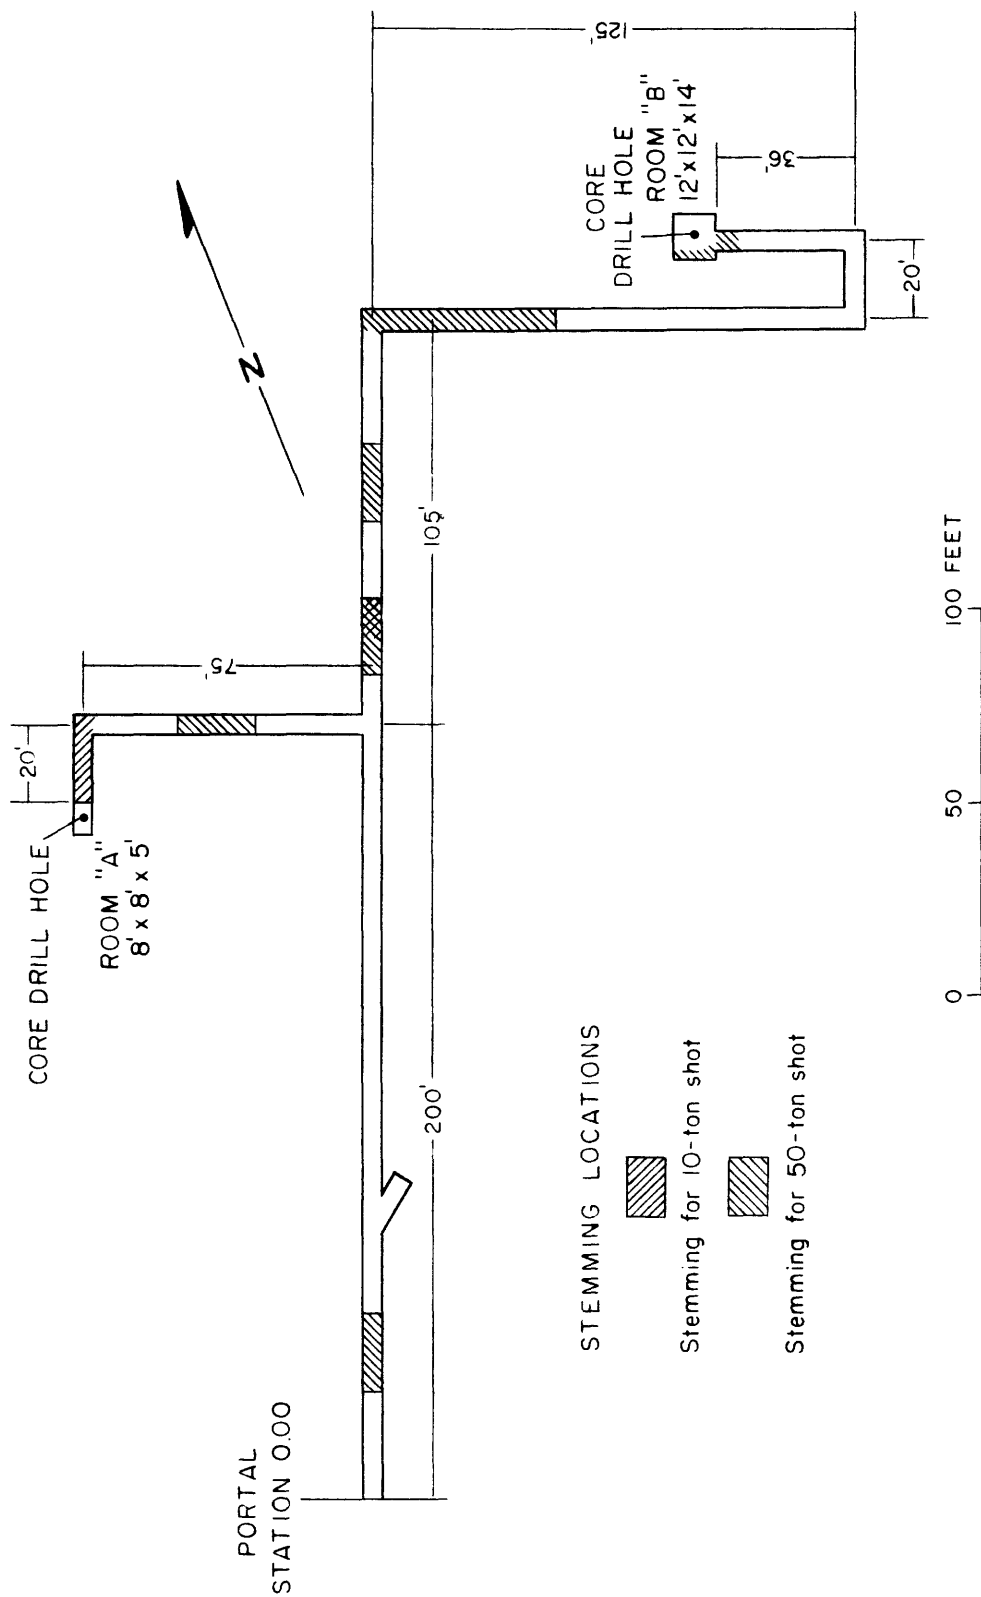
PLAN OF U.S.G.S. TUNNEL SHOWING STEMMING
